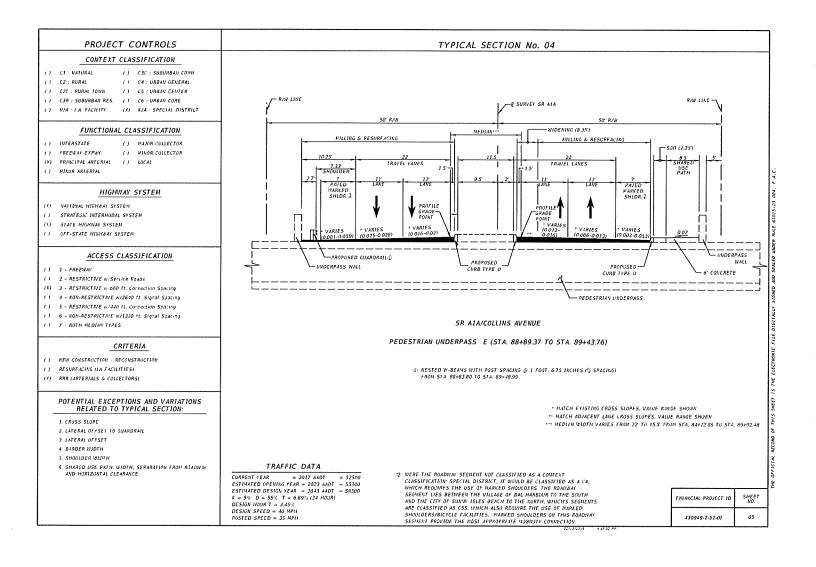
EXHIBIT A: DEPARTMENT'S TYPICAL SECTION FOR THE PROJECT
